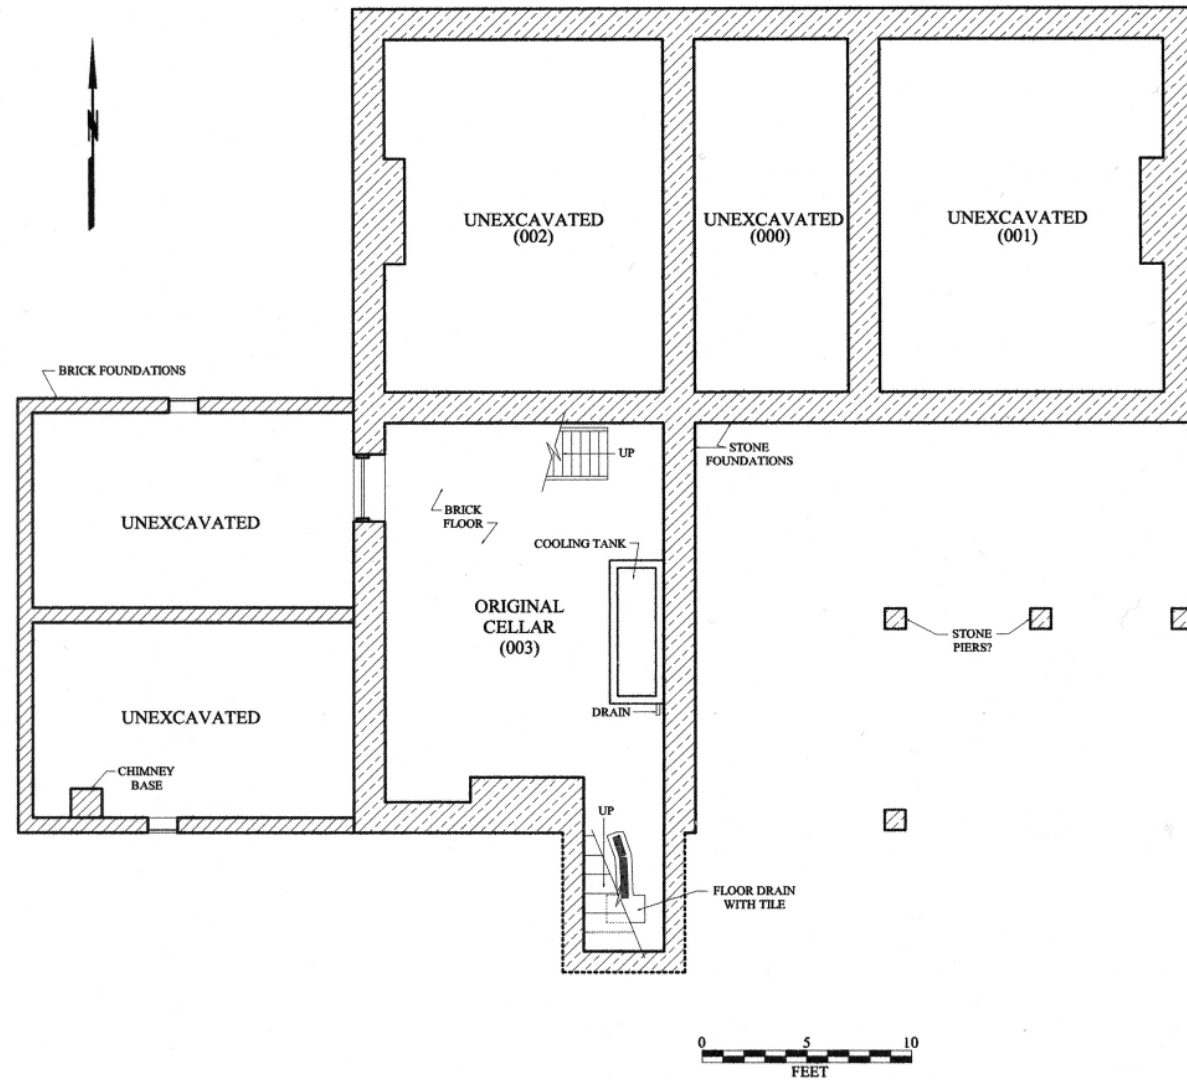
Basement plan of the house illustrating conditions circa 1900.
